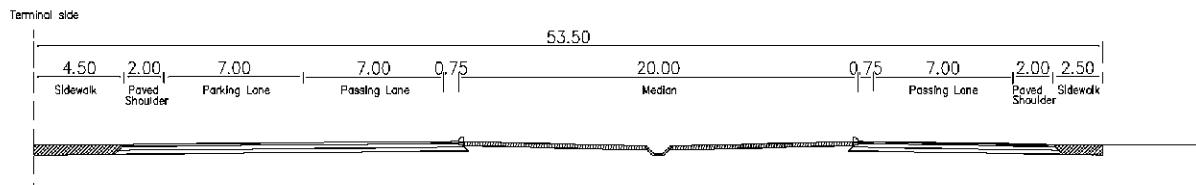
Typical Cross Section of Road Behind Terminal in 2020
